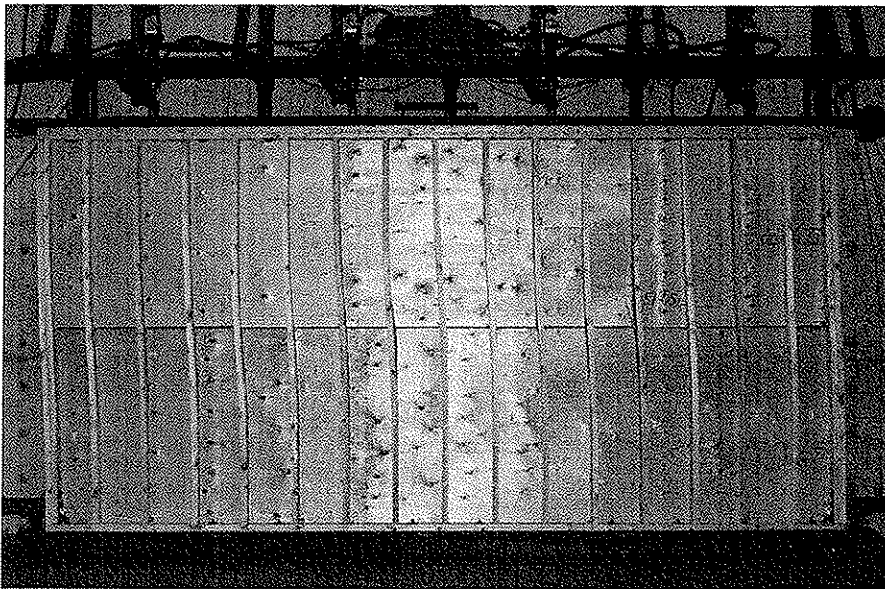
Deformed shape of unblocked shear walls under wall configuration 1.
